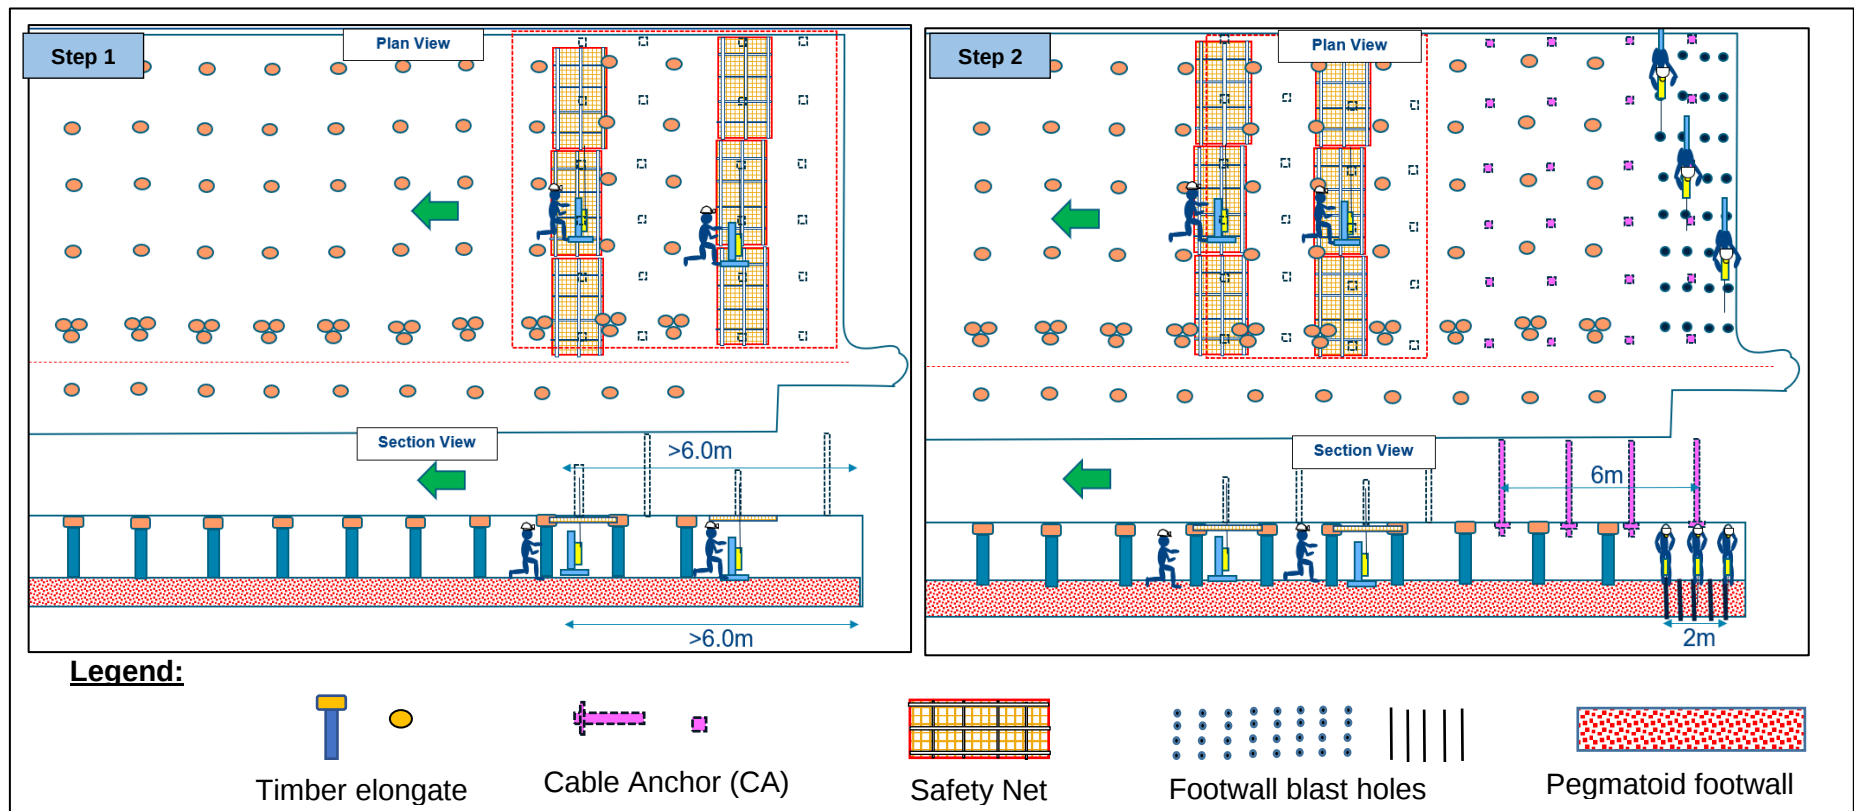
Cable anchor pre-support work and footwall drilling to establish the trench (Tati, 2022)
